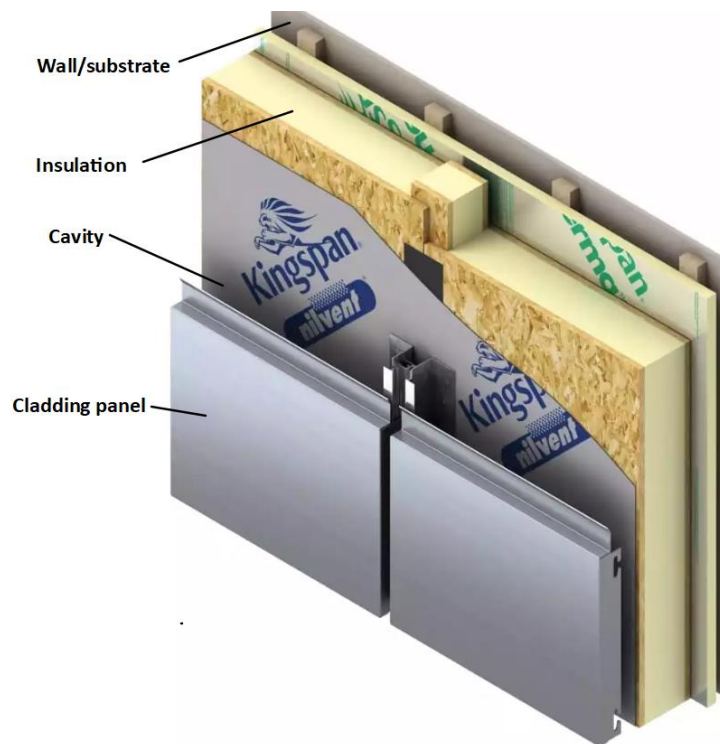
An example of ventilated cavity system: rain screen cladding system[7]
